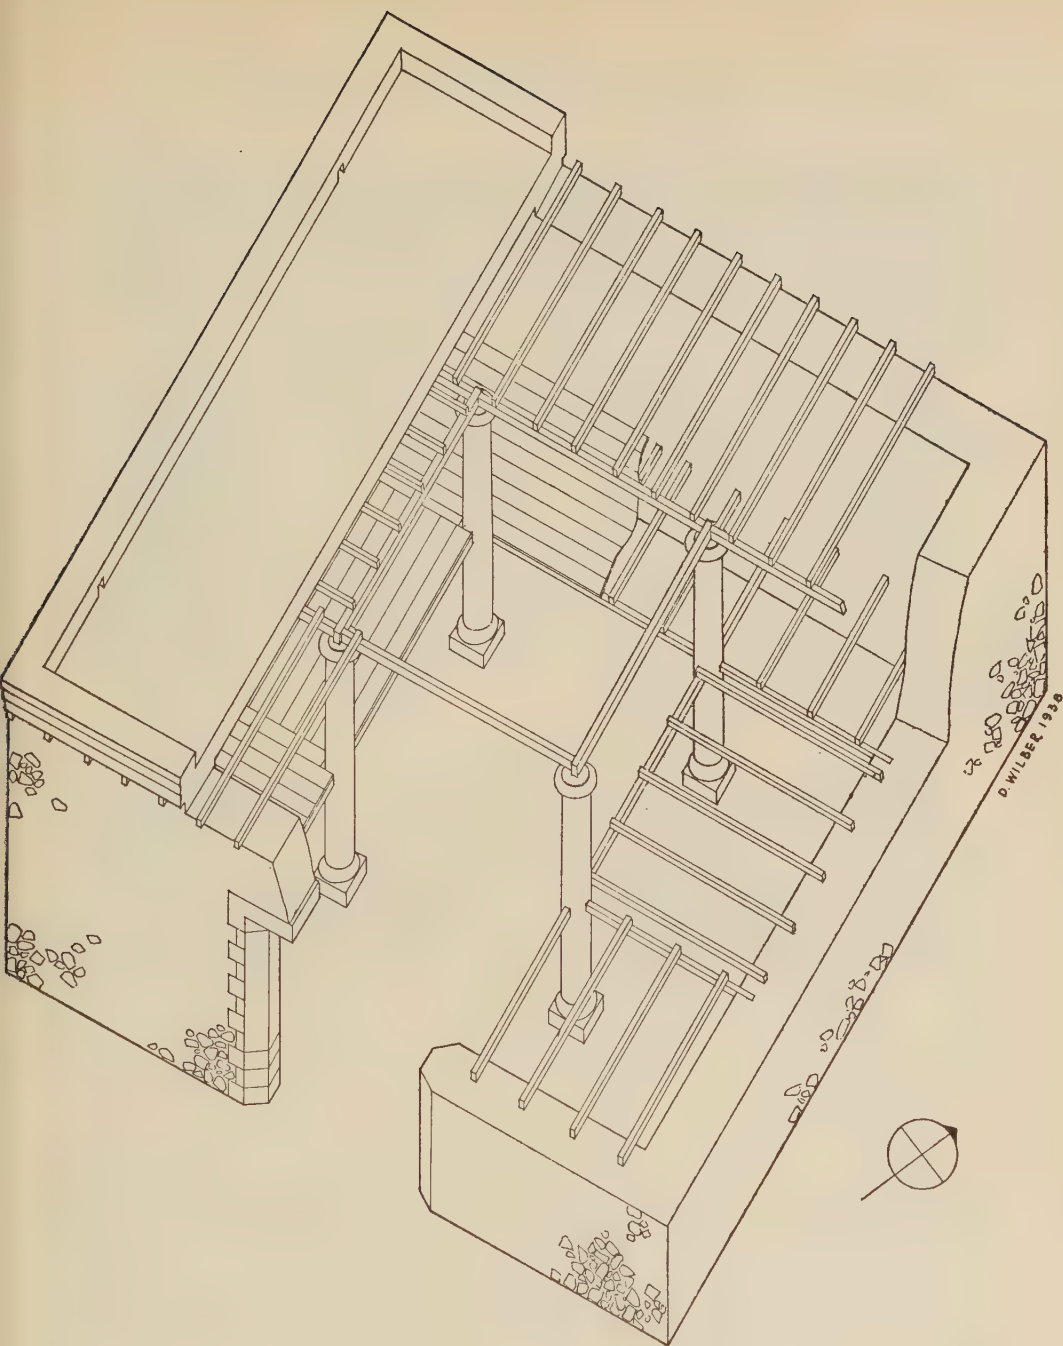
RECONSTRUCTION DRAWING OF STRUCTURE A, TAKHT-I-SULAYMAN
